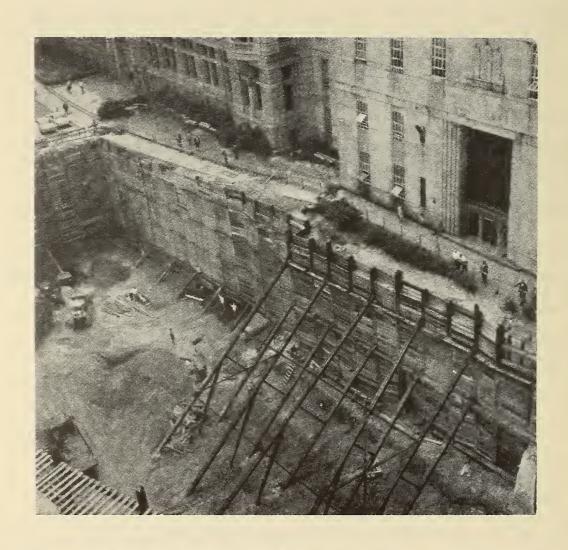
TWO CENTER PLAZA, BOSTON, MASSACHUSETTS. Rakers clutter the site with obstructions, while tiebacks simplify excavation. (By permission of Robert A. Lapointe.)
